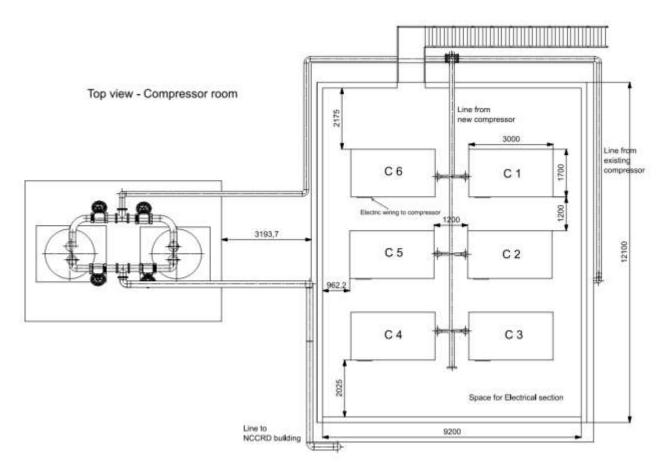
Top view of the proposed new compressor facility(refer Fig 4 for pipe end connections details)
